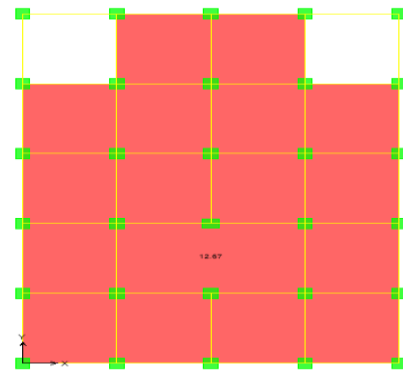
Swimming floor load 12.67kN/m under zone II and zone IV
